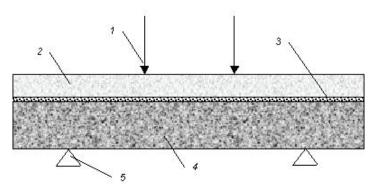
Design scheme for testing a laboratory sample: *1* – loading; *2* – new concrete; *3* – contact layer; *4* – old concrete; *5* – support conditions
